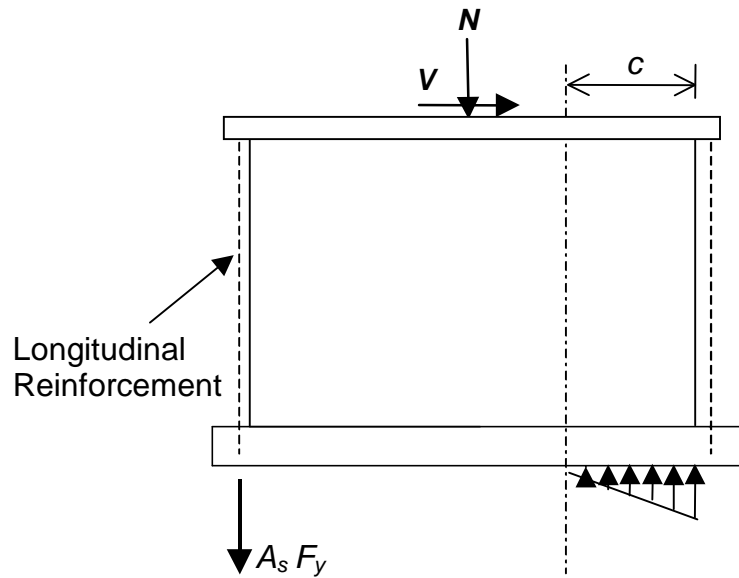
Flexural theory applied to shear wall pilot specimens at yielding of reinforcement
